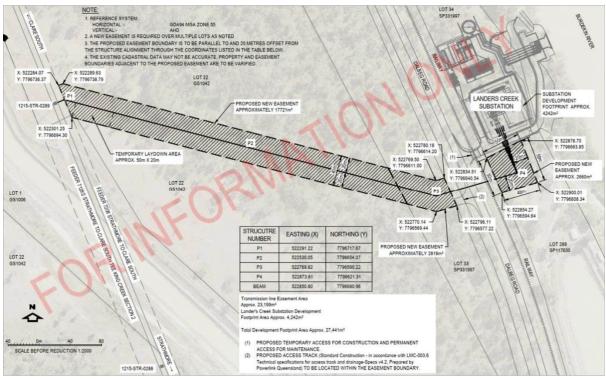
Site Location, Layout and Access Arrangements – Landers Creek Substation & OHTL [Source: Powerlink]
